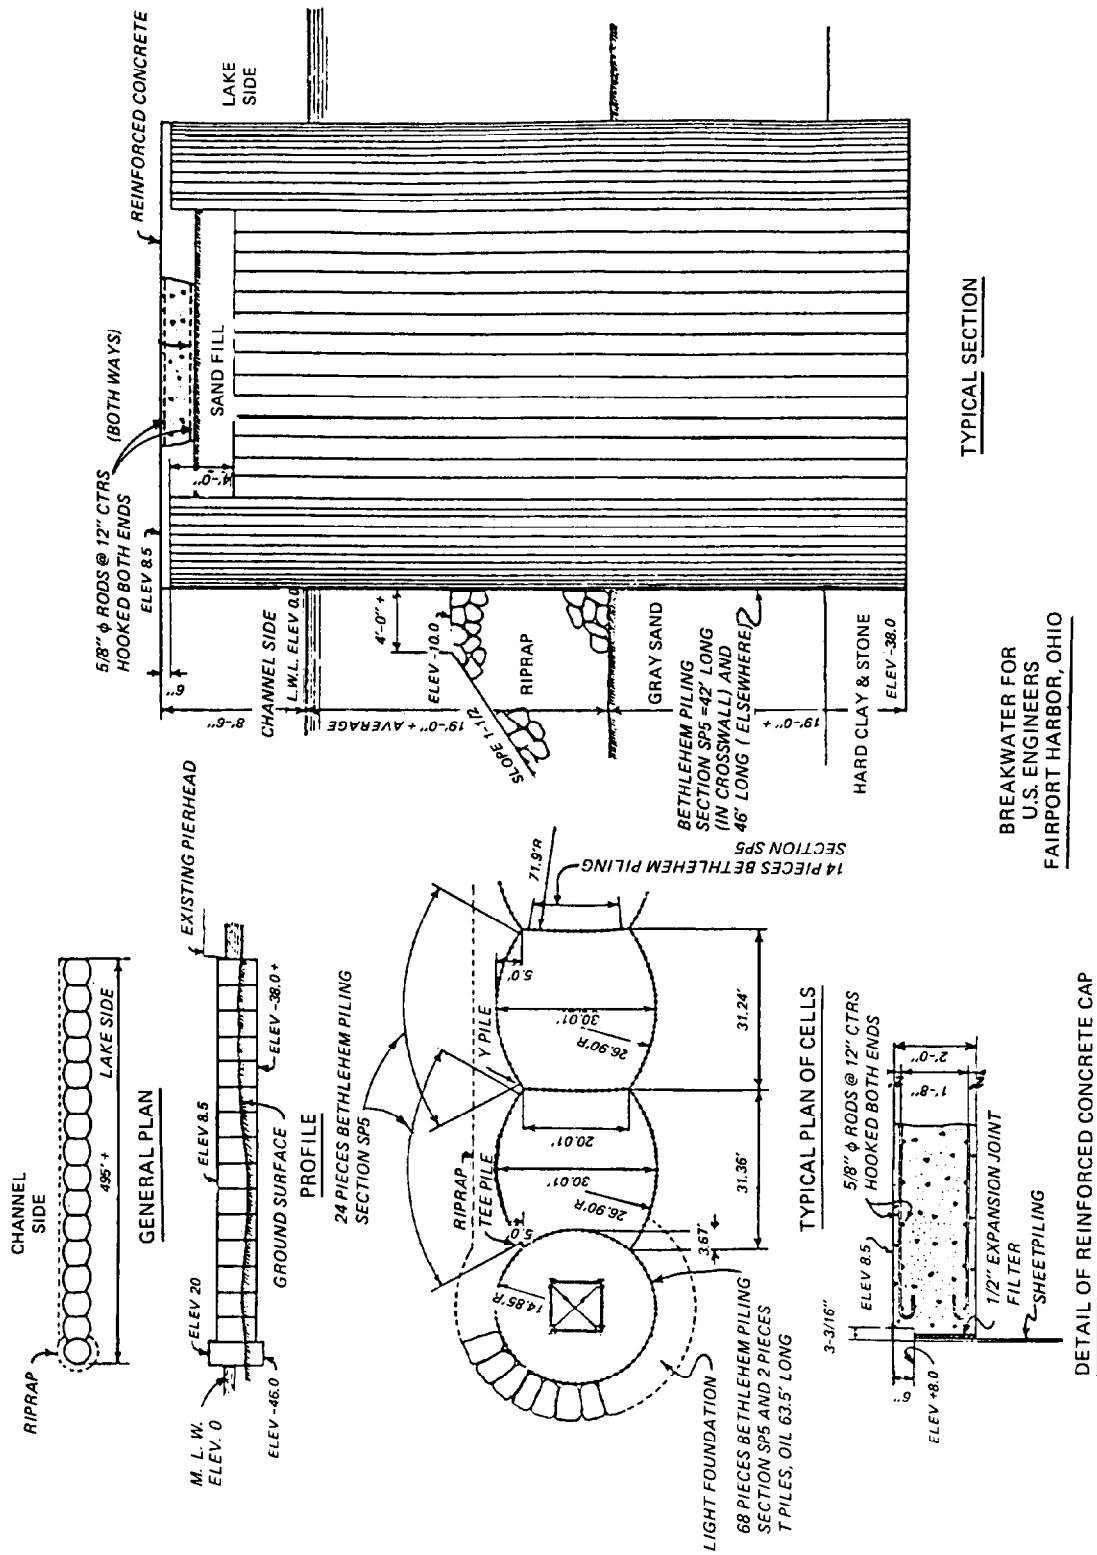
Steel sheet pile breakwater constructed at Fairport Harbor, Ohio
